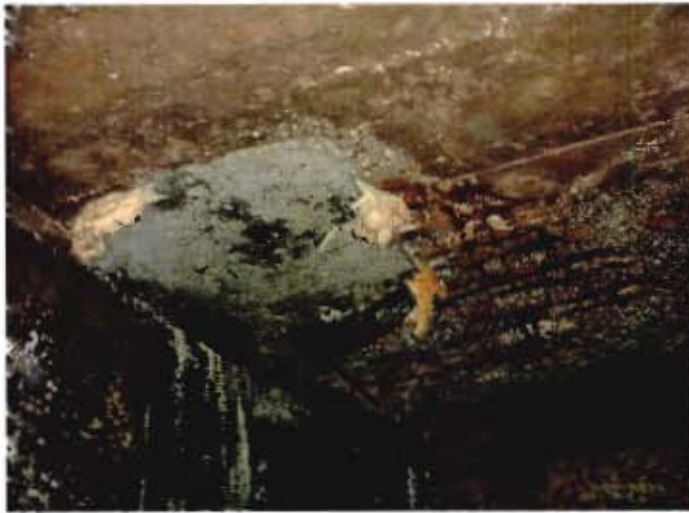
Failure of previously performed repairs at Jetty 1, St Helena Bay
